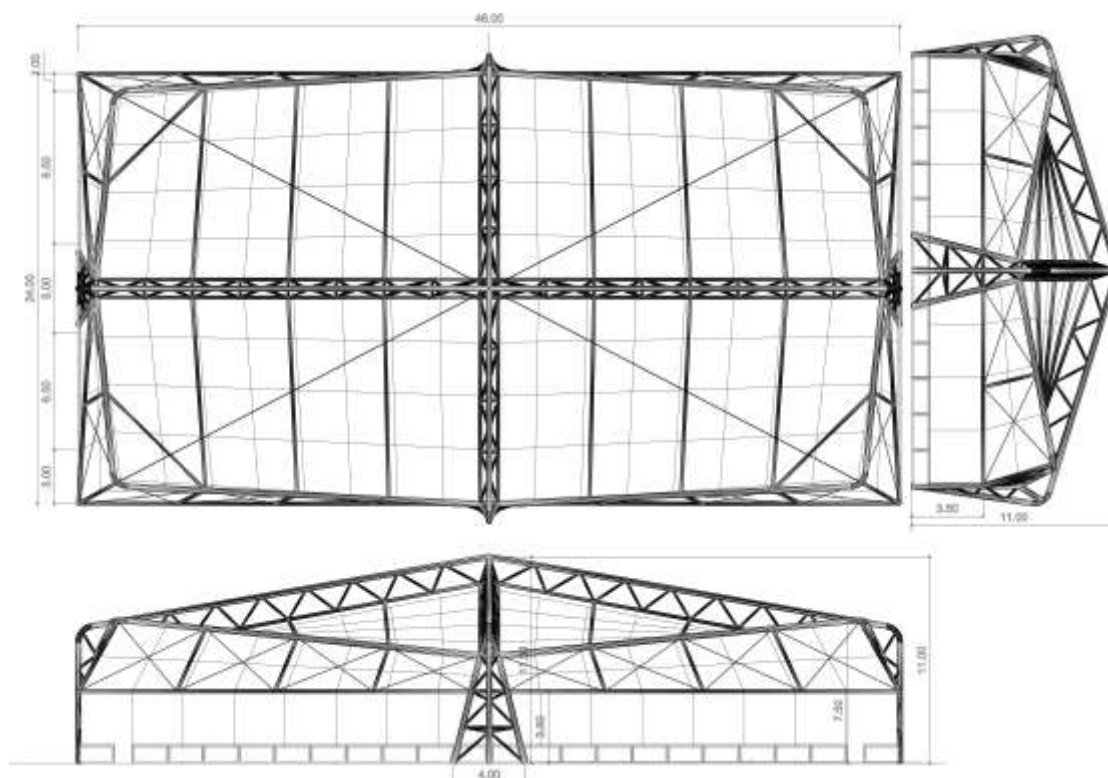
Structural layout plan of the roof for the multifunctional sports court (units: m)
